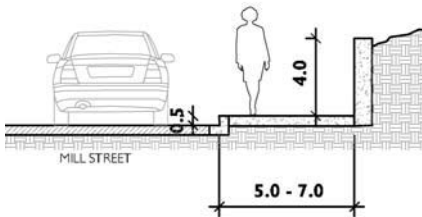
Mill Street Sidewalk Improvement: Alternative B
